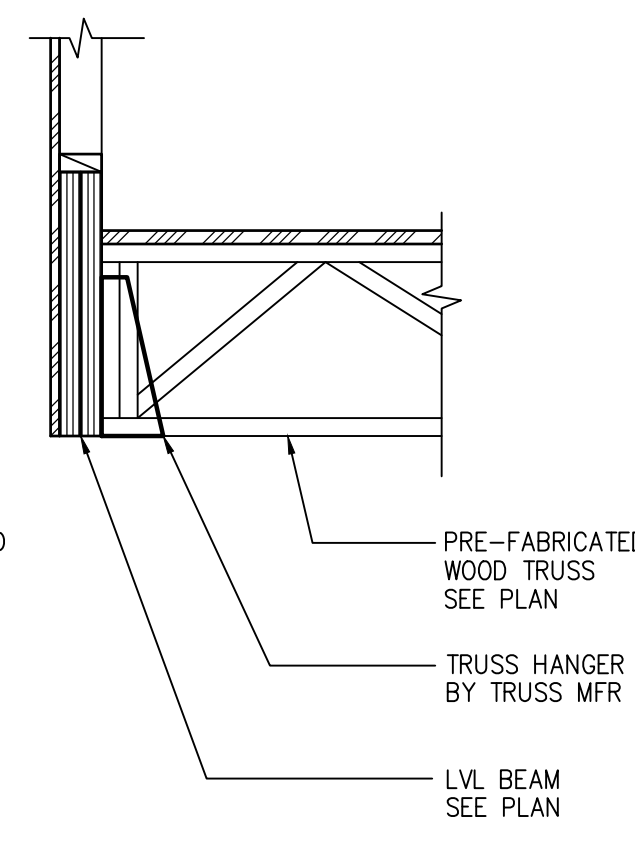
DETAILS SCALE TO 3/8"=1'-0" IN 11X17 SHEET
